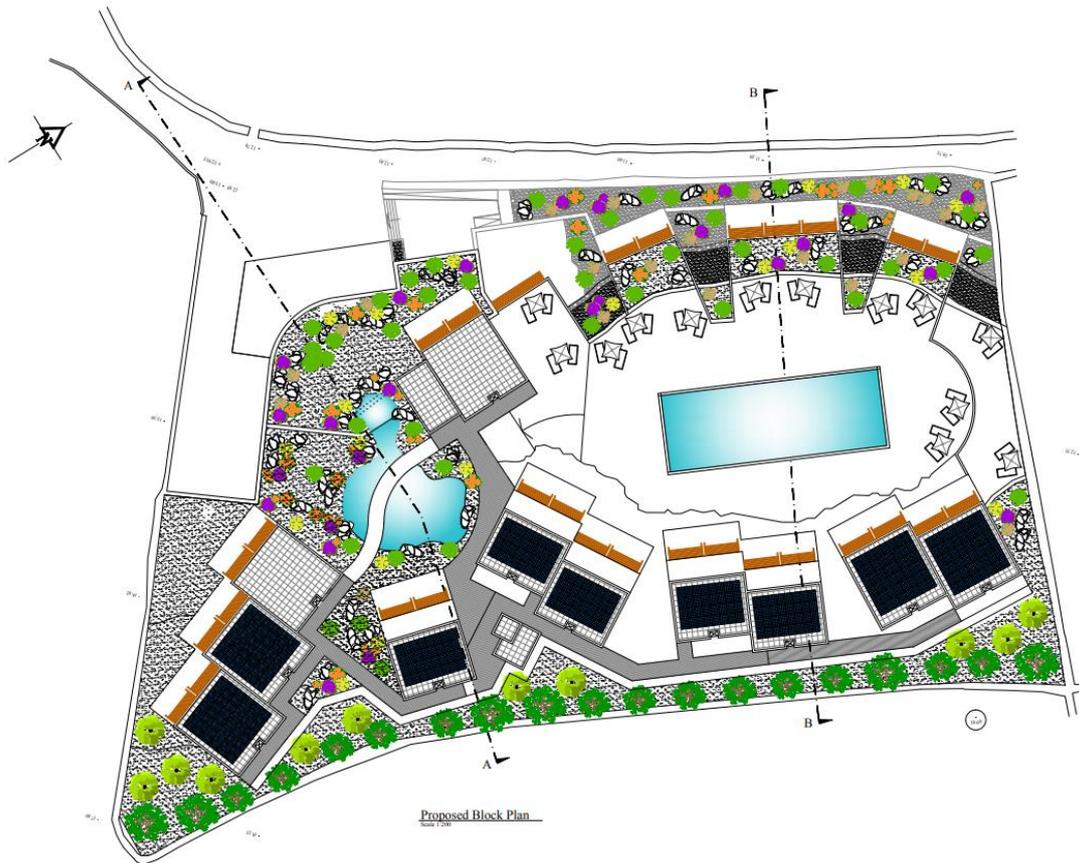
Block Plan (Source: Doc. PA/05732/17/1m)
